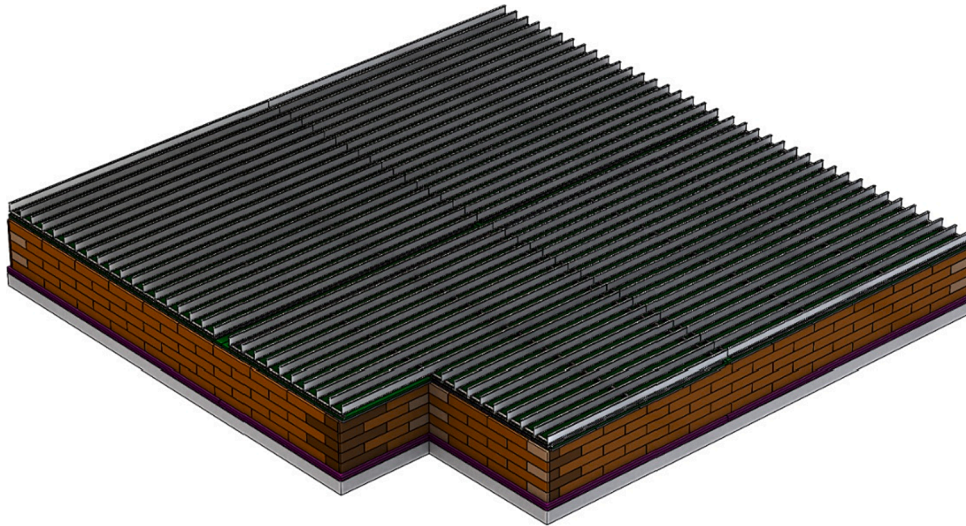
Conversion of the storage facility (building 158) into the repository by installing the engineering barrier of 5.8 m thickness. The storage facility with bearing structures of the engineering barrier placed on the flooring.
